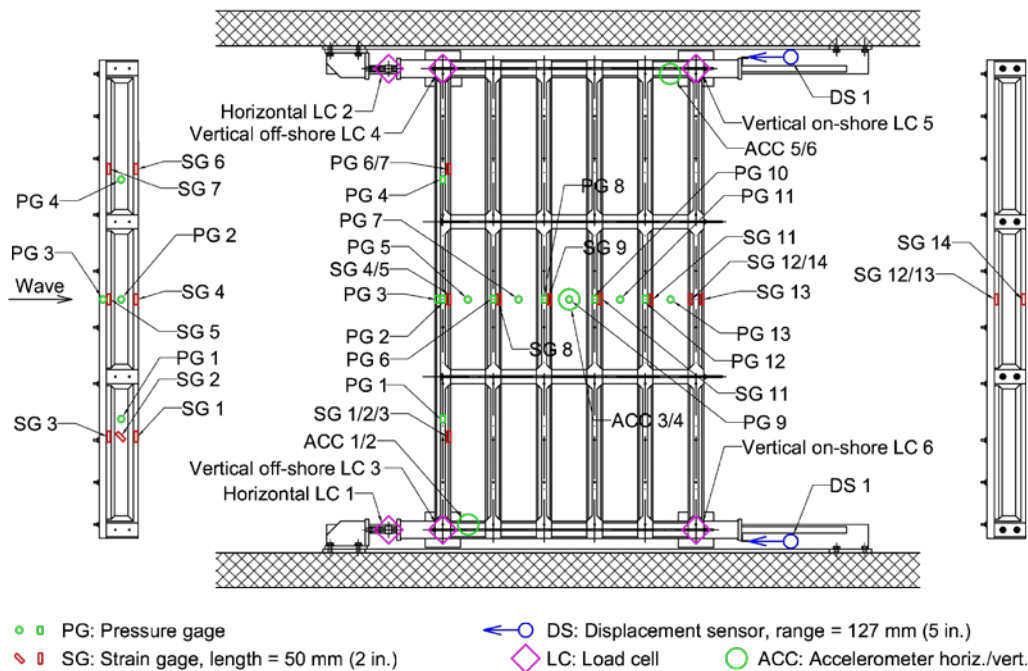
PLAN VIEW OF THE TEST SPECIMEN WITH SENSOR DETAILS.
